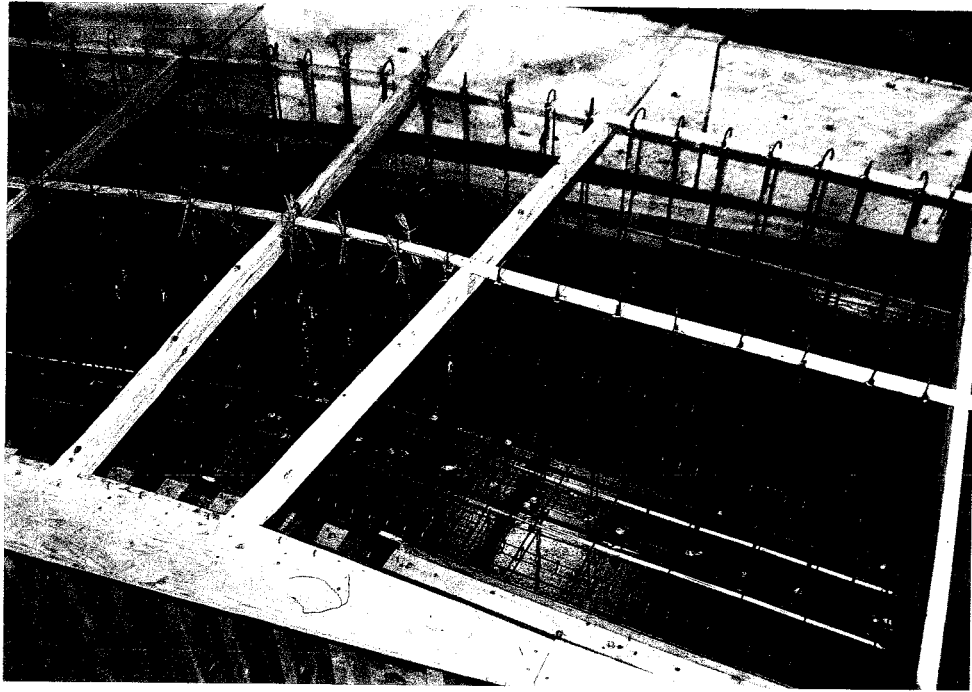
Stirrups and Jig Before Casting Bottom Slab.
